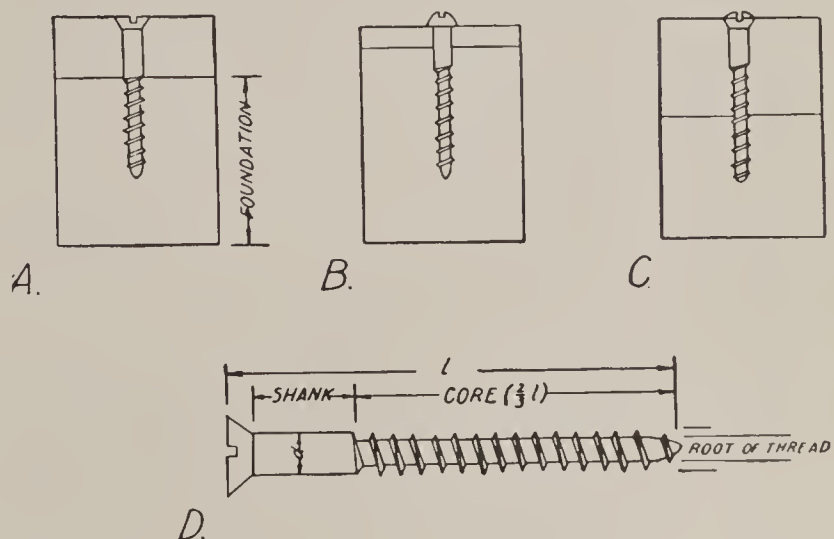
Types and principal parts of wood screws: A, flat head; B, round head; C, oval head; D, parts and dimensions, where l represents the length and d the shank diameter. Screws inserted as in A have maximum resistance to direct withdrawal; as shown in B, maximum lateral resistance; while those inserted as in C have relatively low resistance in both properties.
